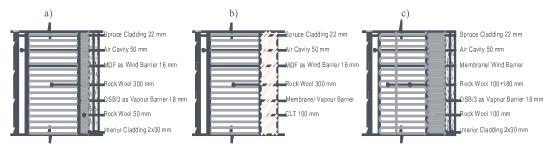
Configuration of the wall constructions: a) AWI 05, b) AWh 01 and c) AWI 01.
